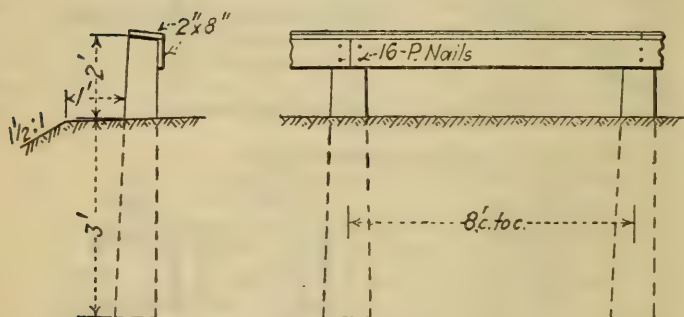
A.—Wooden guide rail U. S. Bureau Public Roads 1926.
